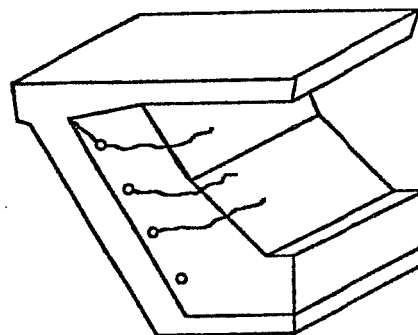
Diaphragm Cracking Due to Spreading of Tendon Forces
